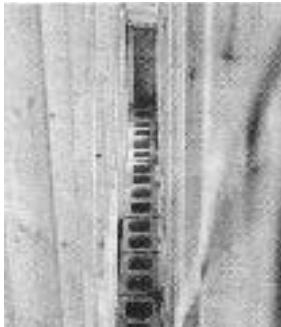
When building double walls, care must be taken to maintain their separation at interior/exterior corners. One option is stopping the exterior sheathing about 1/2 inch short of the corner and backing the gap with flashing.
